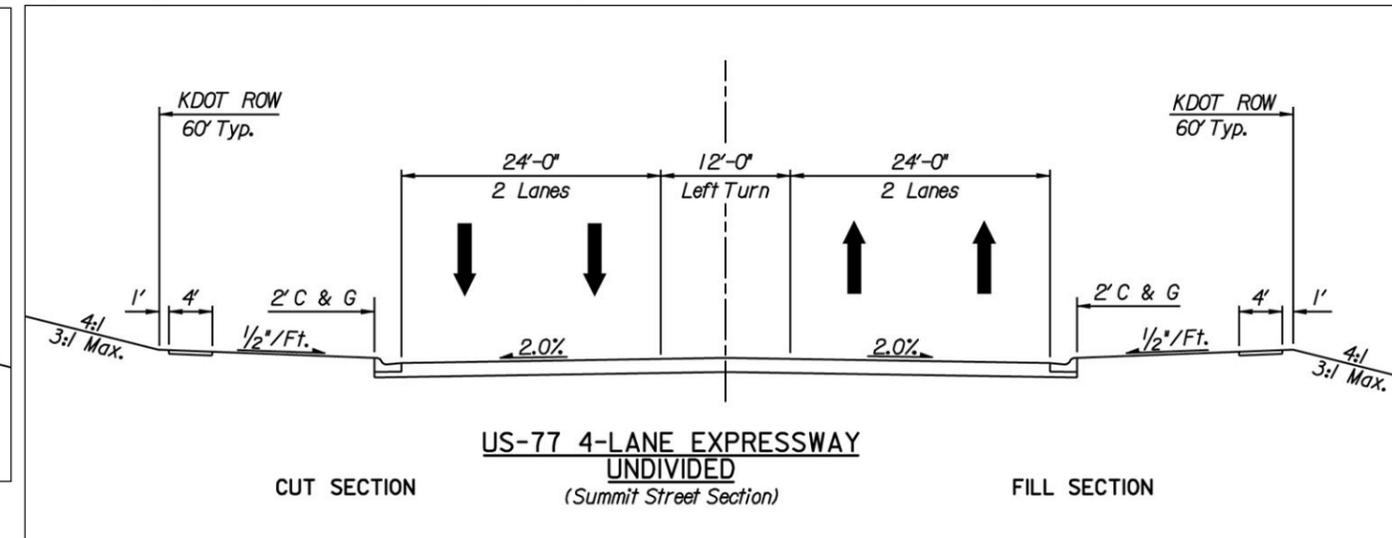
Typical Section, Four-Lane Expressway Undivided (Summit Street Section)
